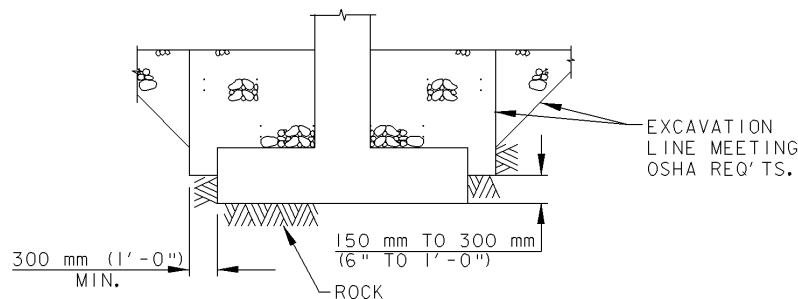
Footing on Non-Erodible Sound Rocks
